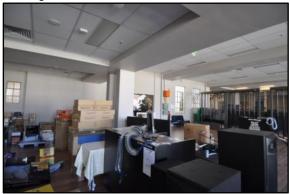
Interior with contemporary wall, floor and ceiling finishes and bulkheads of former rooms below caretakers flat. Original steel windows.
